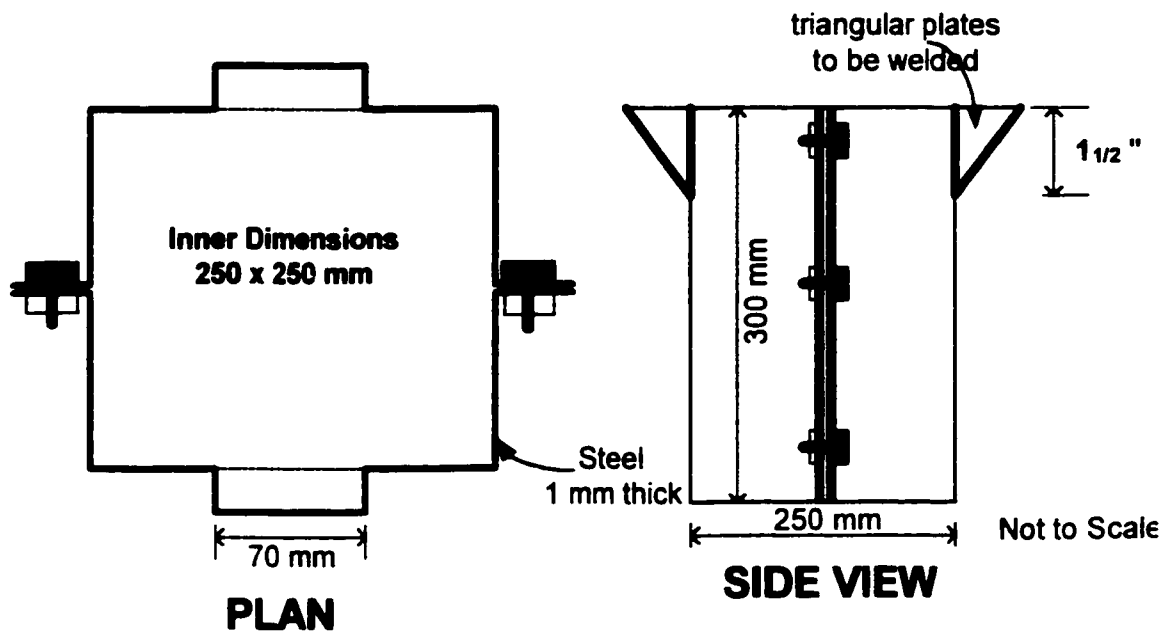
Watertight formwork for columns to be repaired with FMCX
